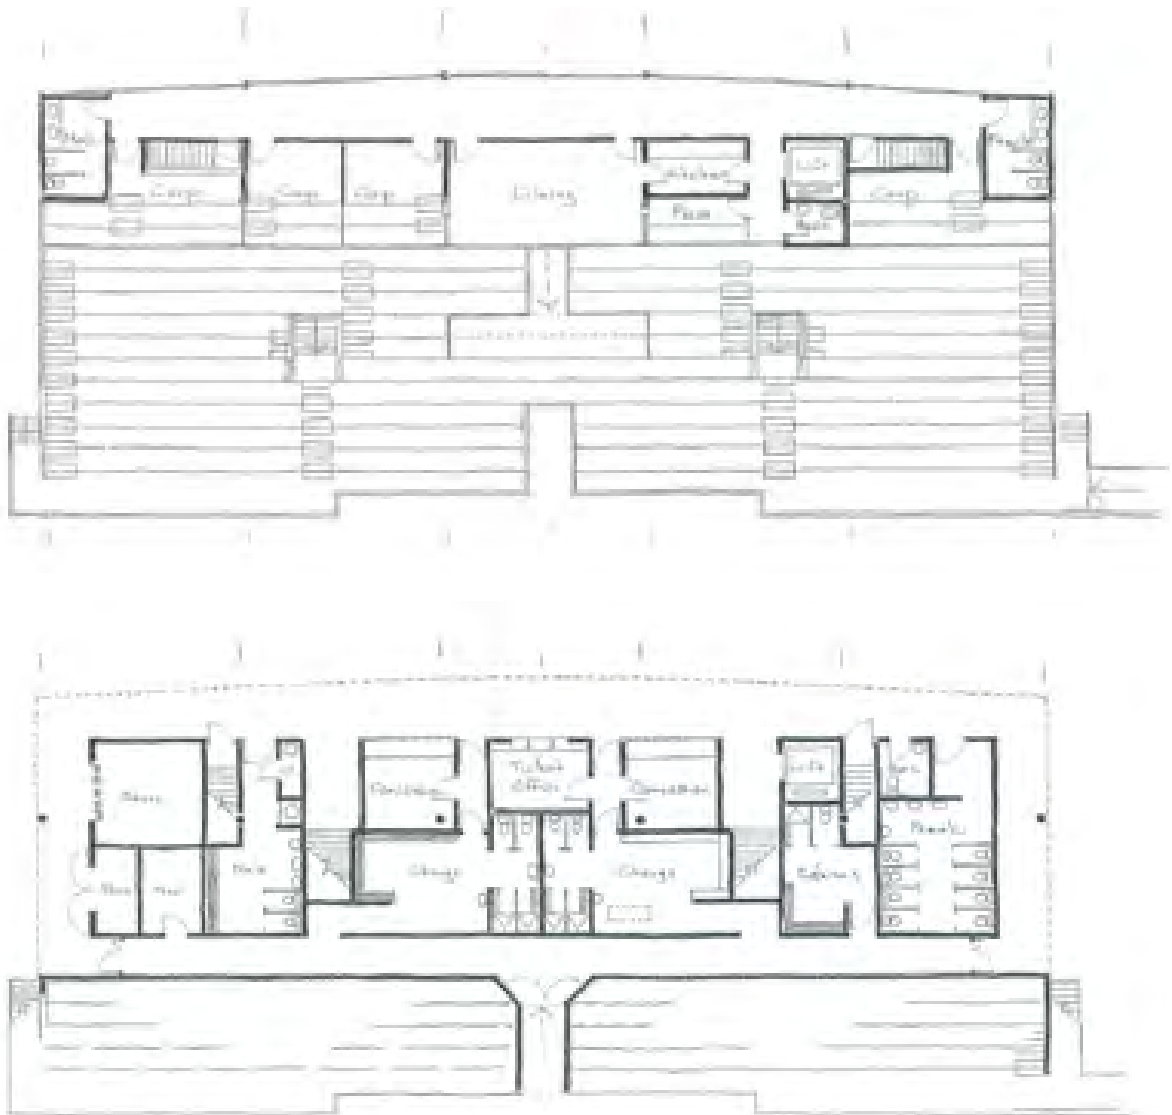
Indicative Plan of proposed stadium (Not to scale)
